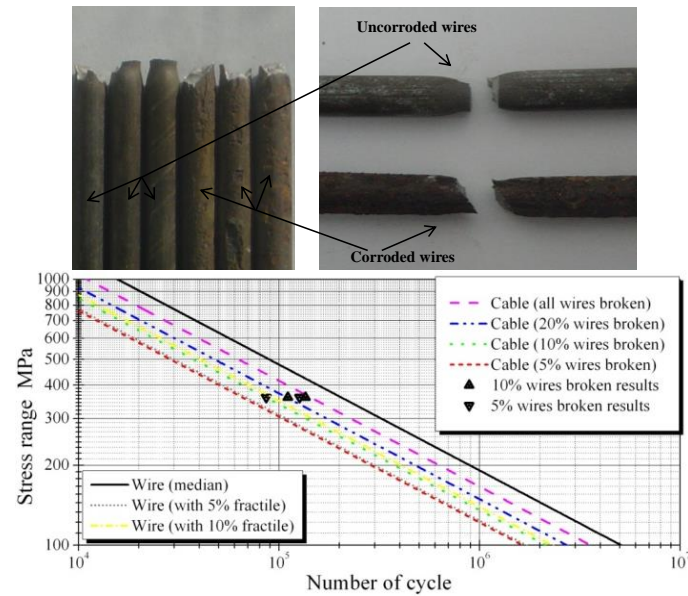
Fatigue failure of individual steel wires and fatigue life of cables with corrosion
